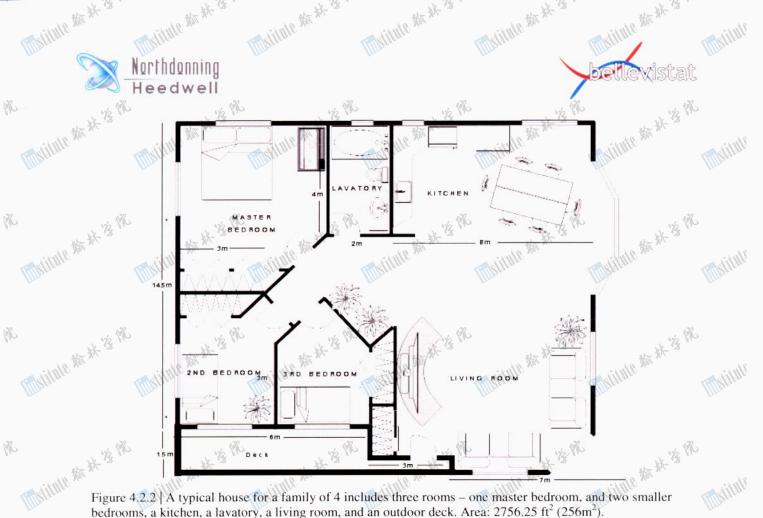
A typical house for a family of 4 includes three rooms – one master bedroom, and two smaller bedrooms, a kitchen, a lavatory, a living room, and an outdoor deck. Area: 2756.25 ft² (256m²).
